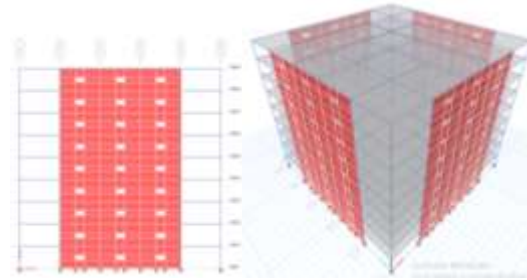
Edge shear wall +Corner Shear wall + Core model with 5% Openings
